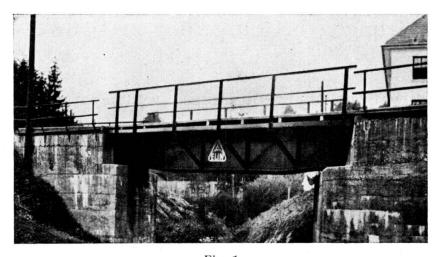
Electrically welded railway bridge at Weiz.
